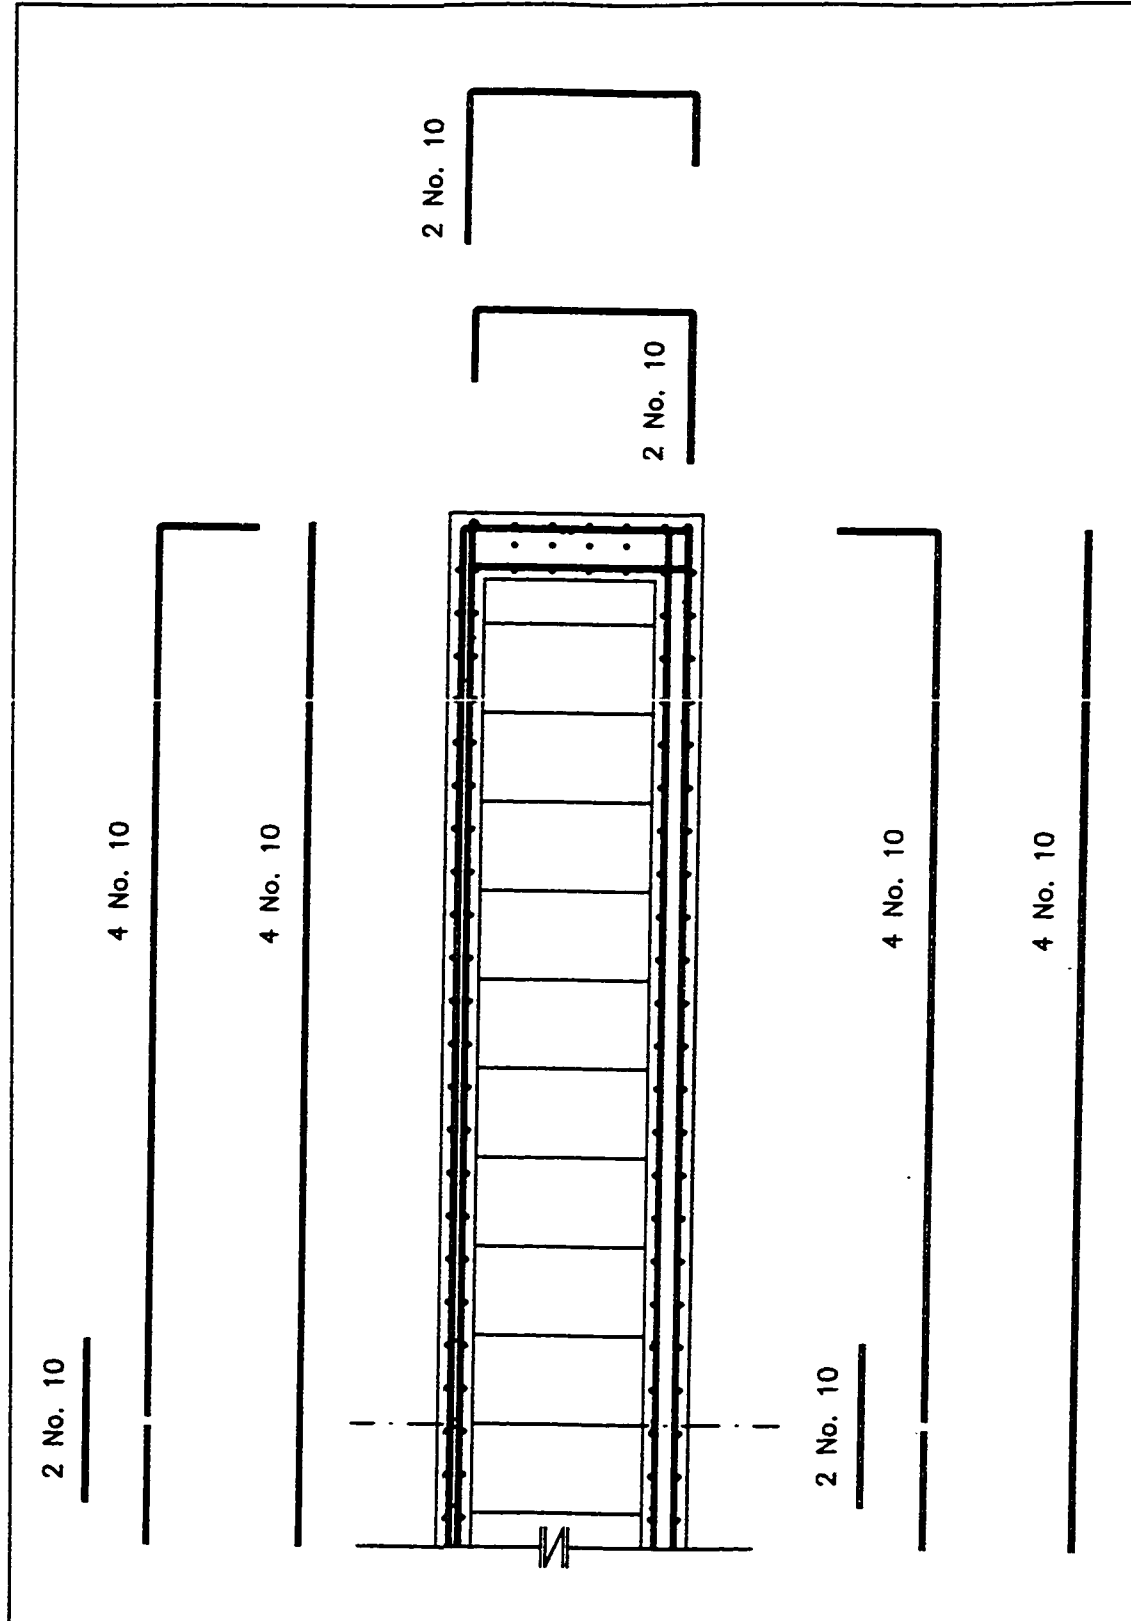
Typical arrangement of conventional longitudinal steel for the test girder, elevation view
